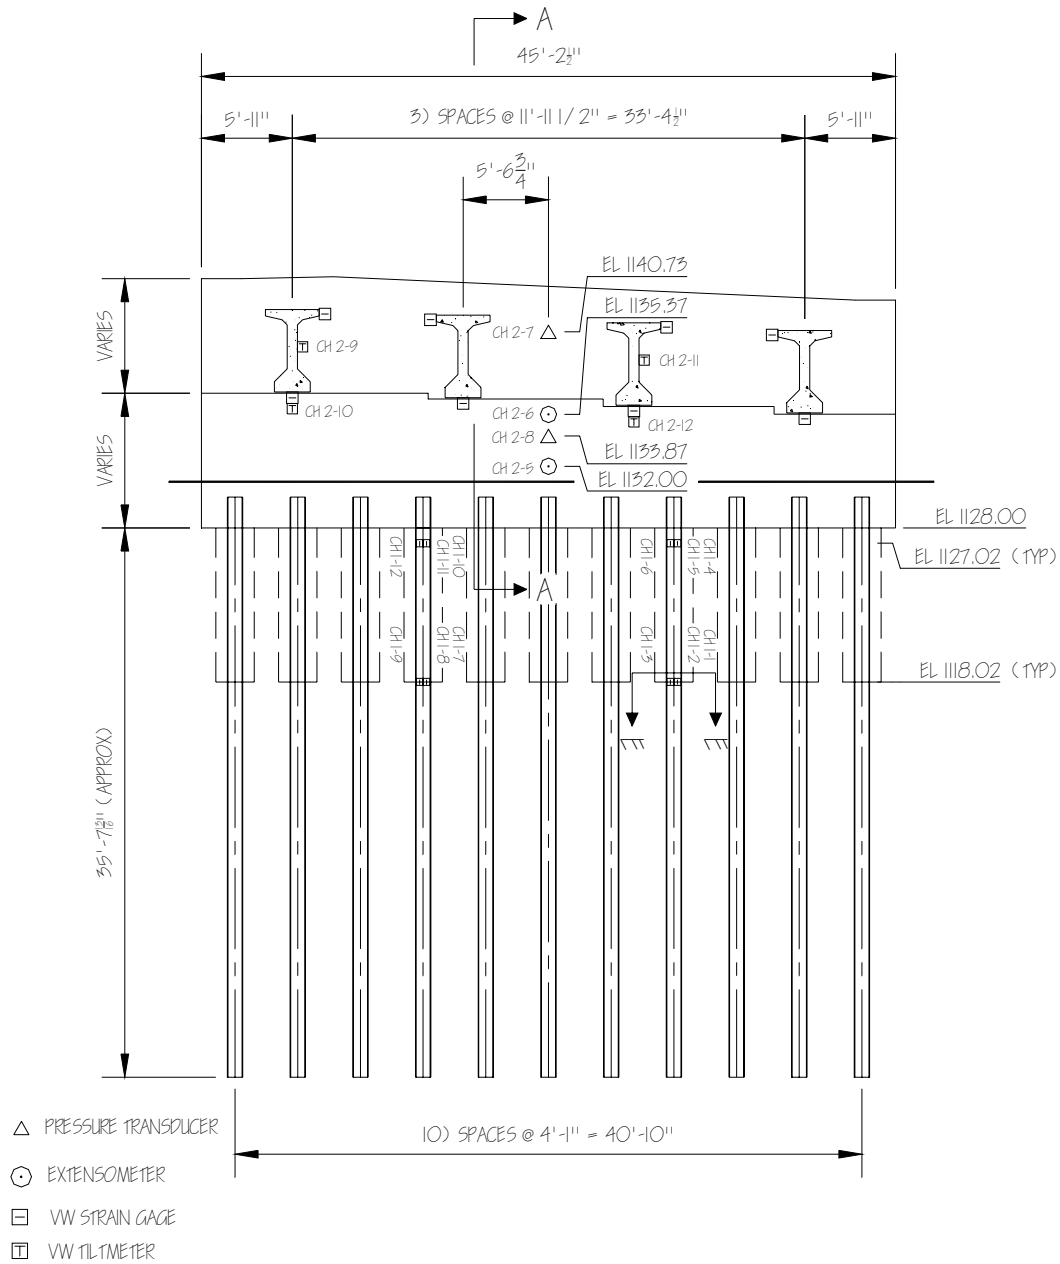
Structure 211 Abutment 2 Elevation (Section B-B)
